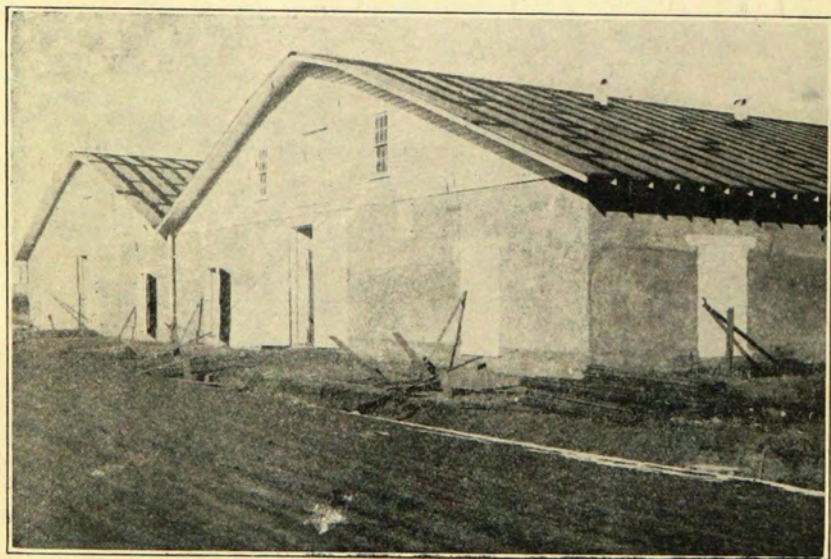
An adobe storage house which is equipped with roof ventilators.
